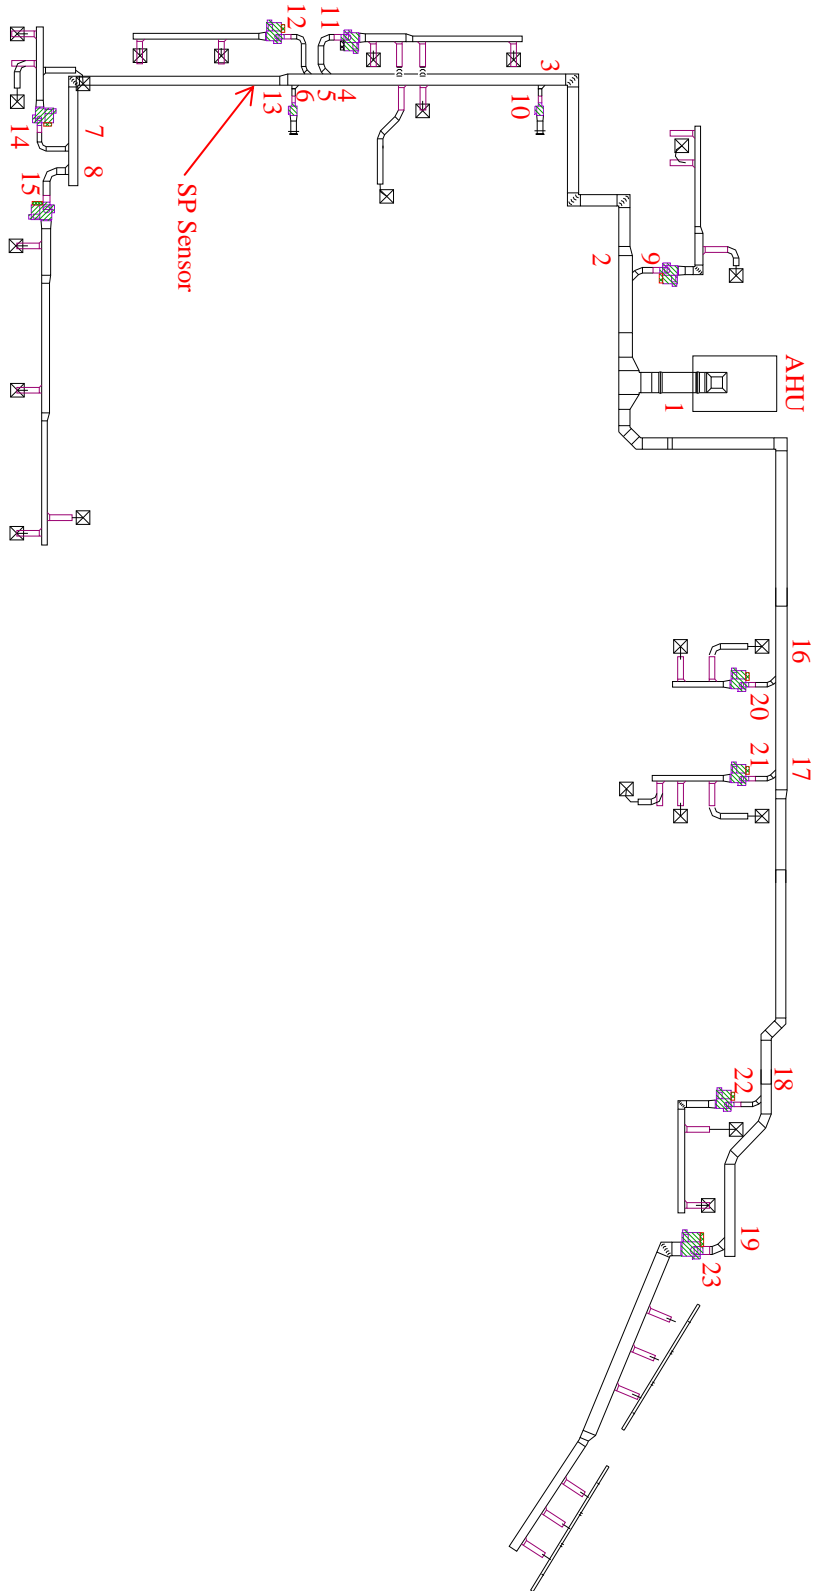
Jack E. Brown building AHU 5-1 duct layout
